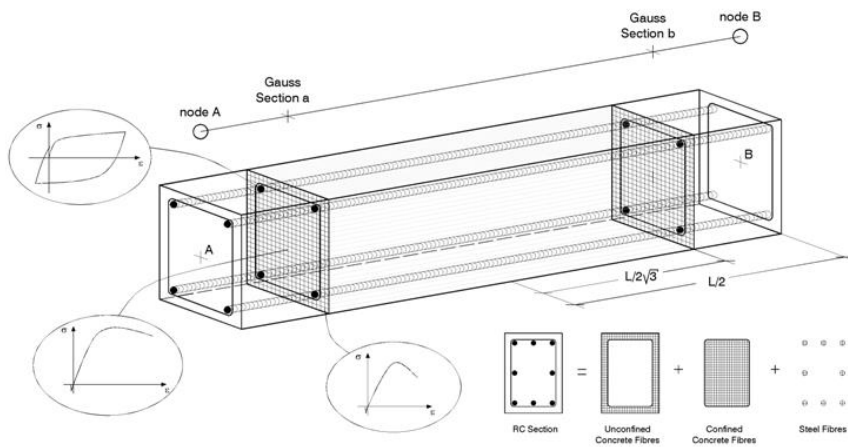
Reinforced Concrete Section (Source: SeismoSoft v7.0, 2014)
